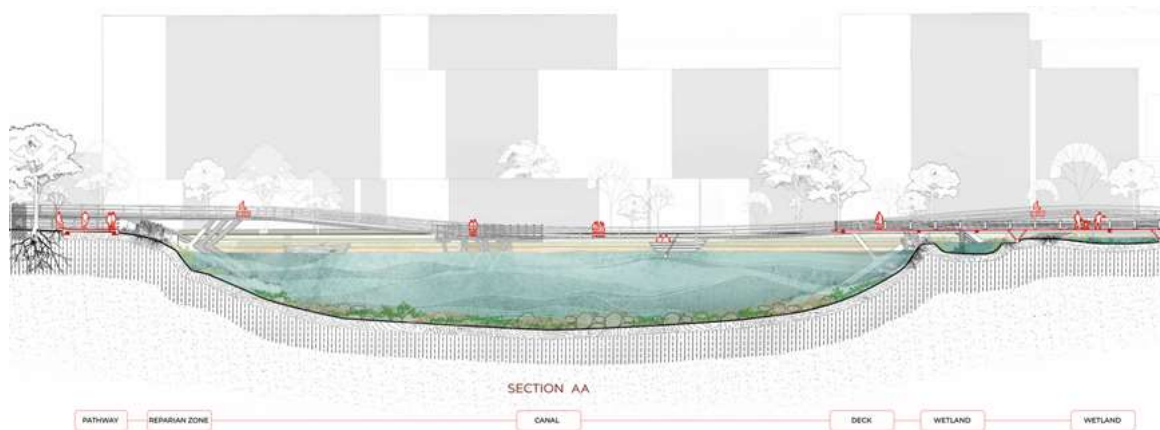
Section AA of the proposed Masterplan for Hazaribagh Canal Revitalization, *Source: Author.
